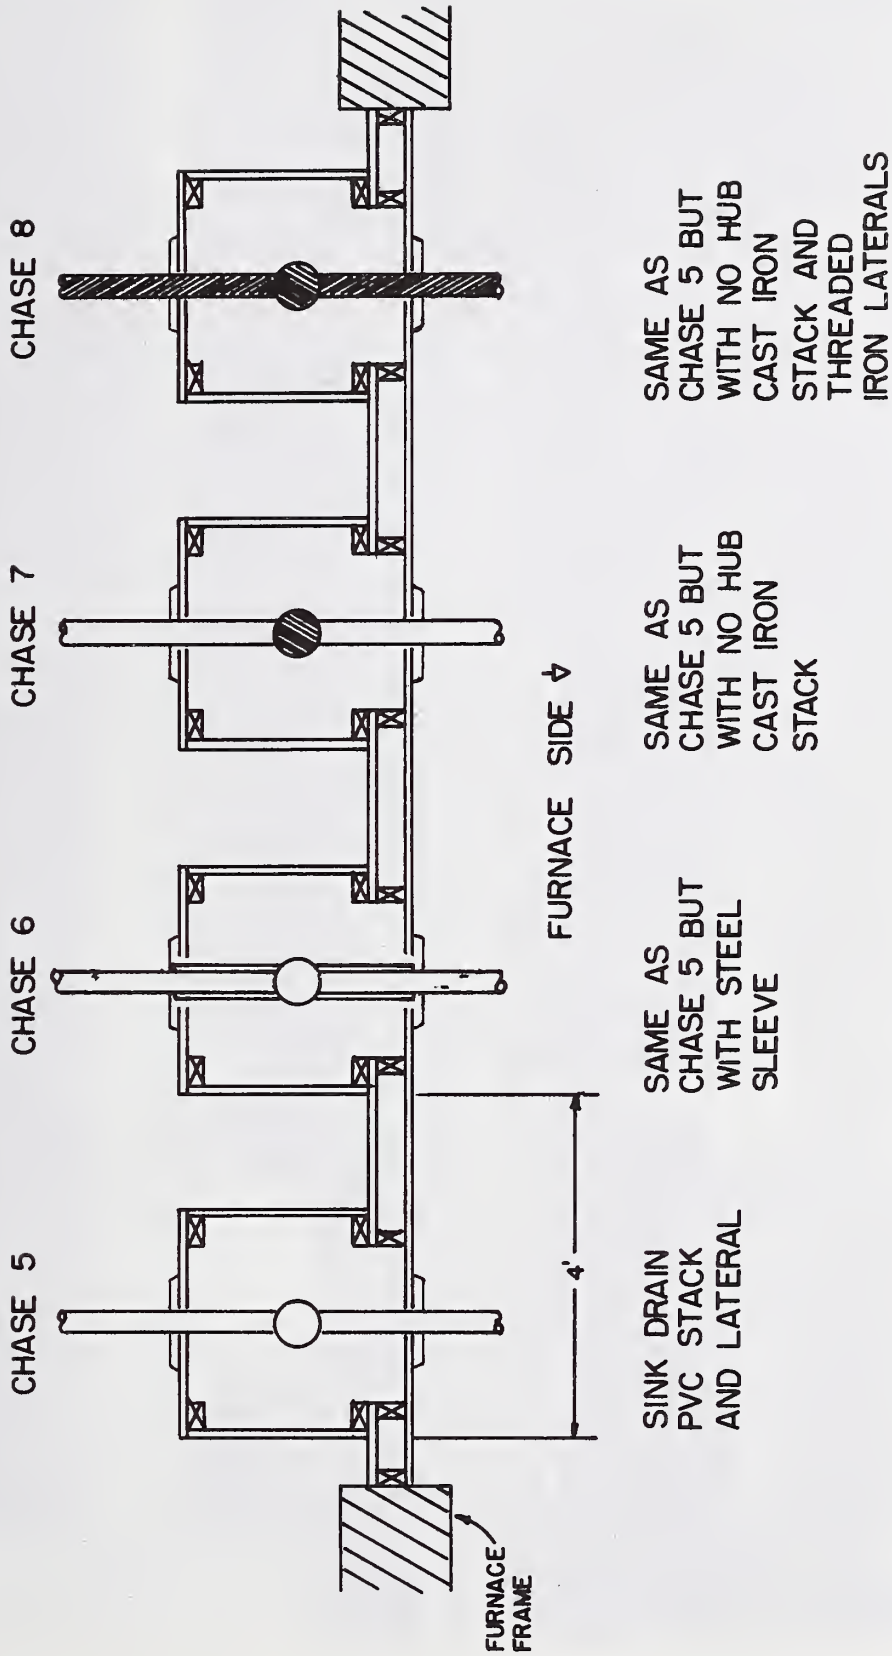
Plan View of Wall and Pipe Chases for Test 2.
